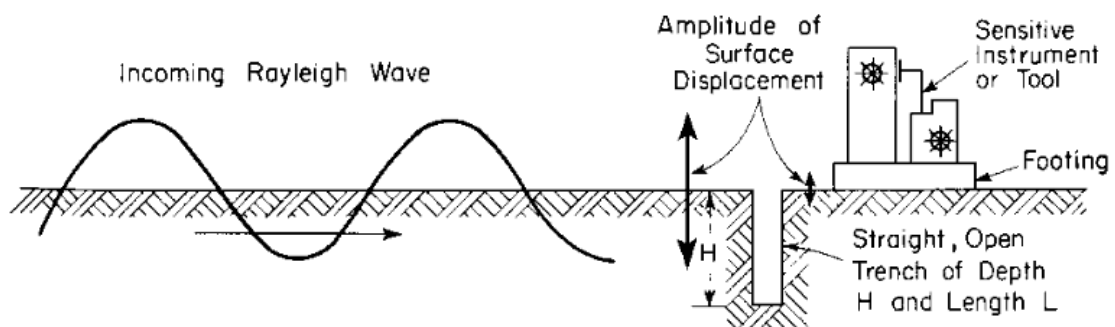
b: Passive open trench to protect buildings with sensitive installations after (woods 1968).
